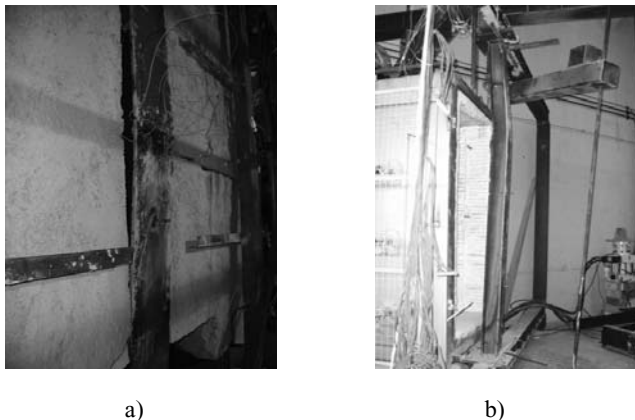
Column E13 after test - web perpendicular to wall – wall thickness 100mm - HEA 160
